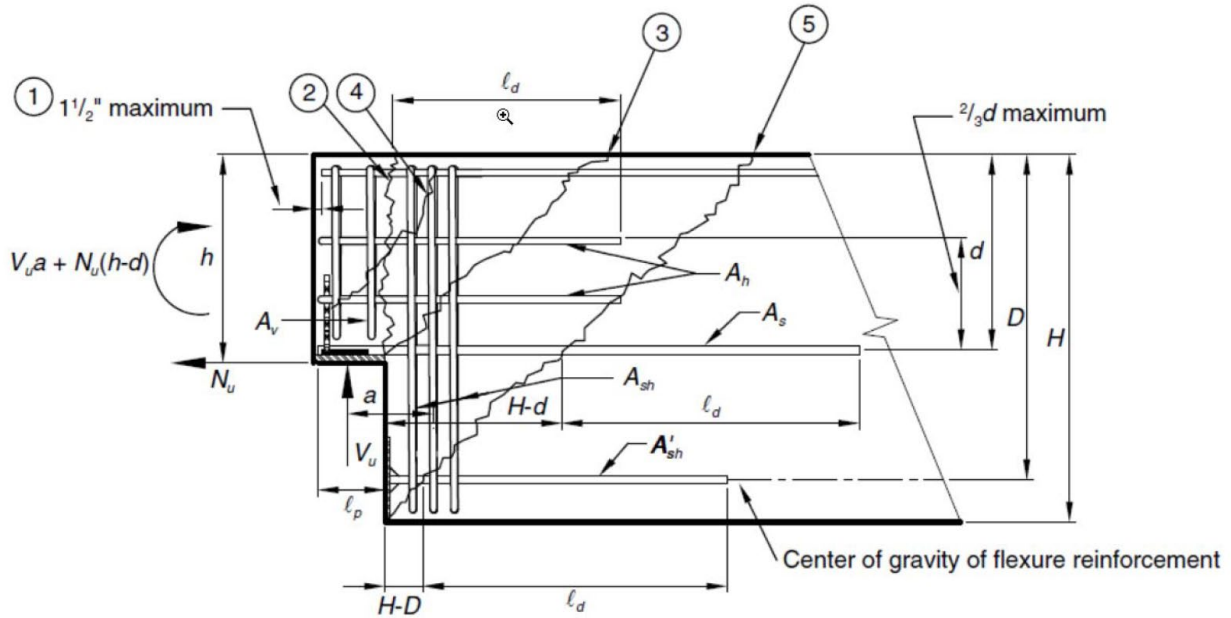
Potential failure modes and required reinforcement in dapped-end connections, PCI Design Handbook, 7th Edition (p. 5-80)
